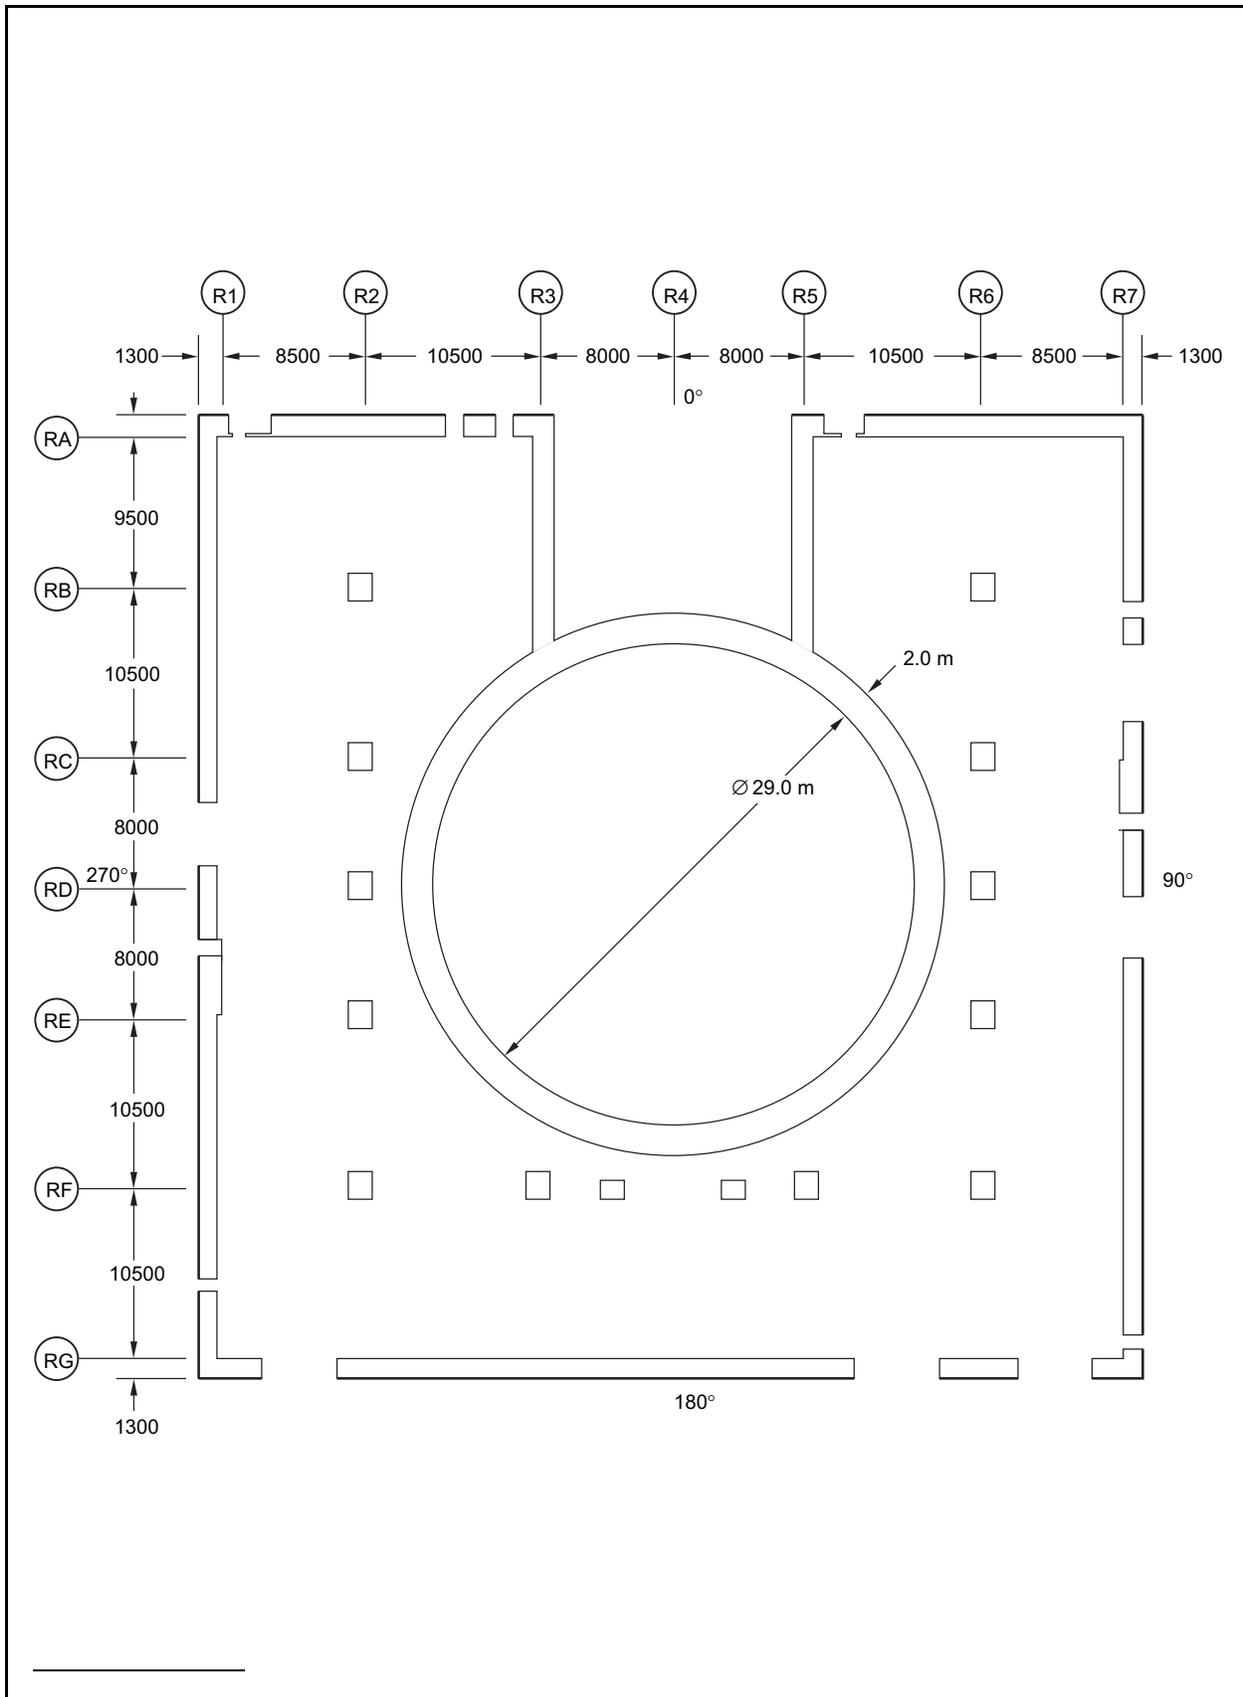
Reactor Building Arrangement Floor 1F Elevation 12300 mm
